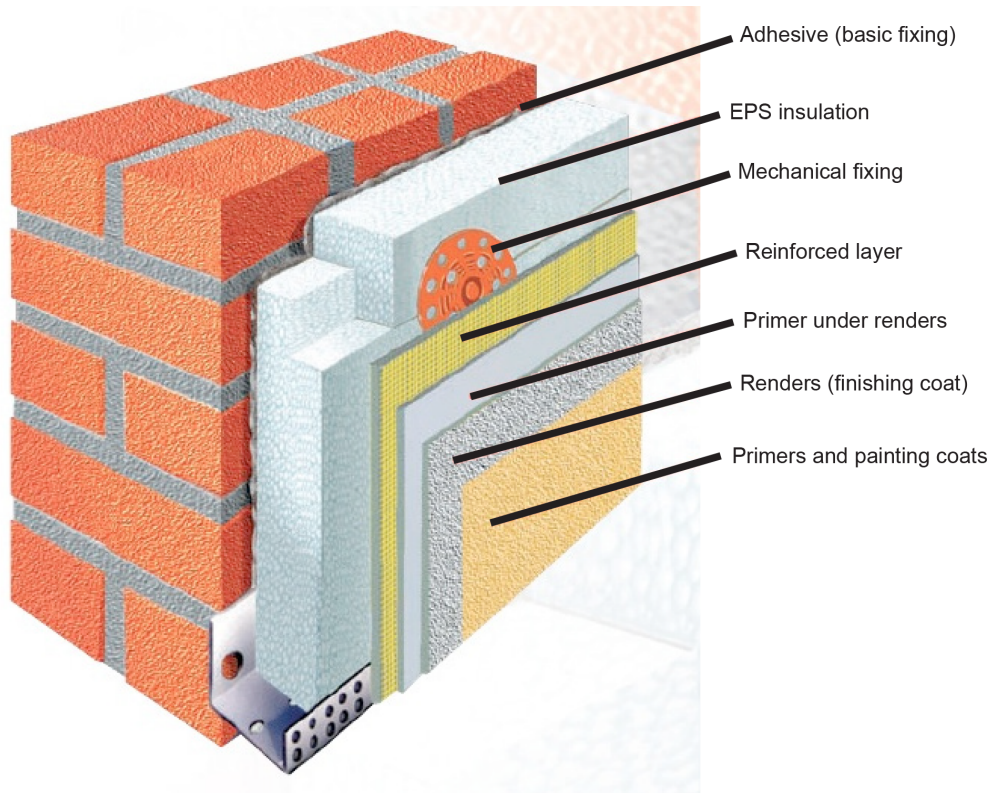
Building wall layers, showing materials that typically surround EPS in insulation applications. [Re-made from 11]
